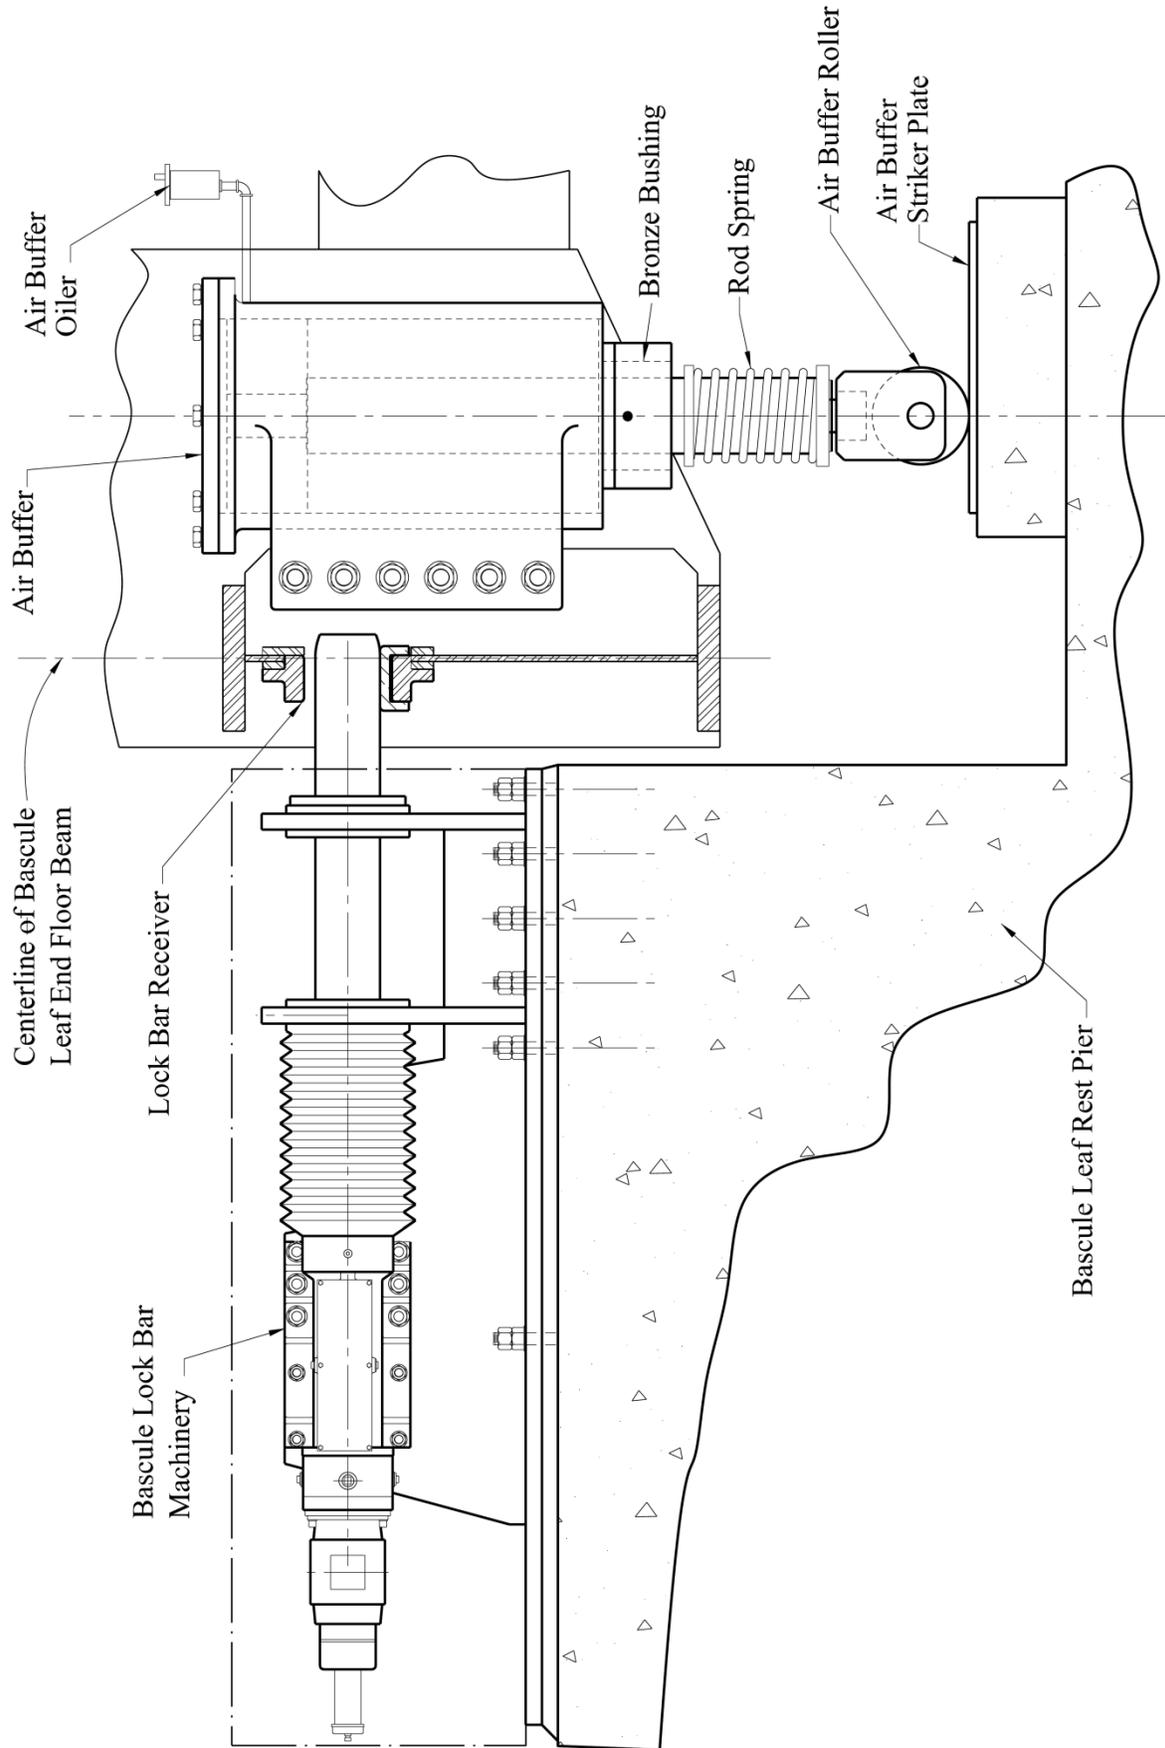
Lock Bar and Air Buffer Layout for a Single Leaf Bascule Bridge
